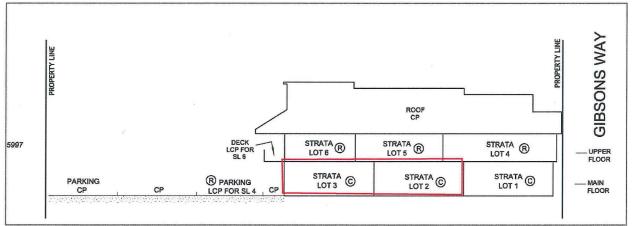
Building Section – Area of Rainforest Compassion Club outlined in red
